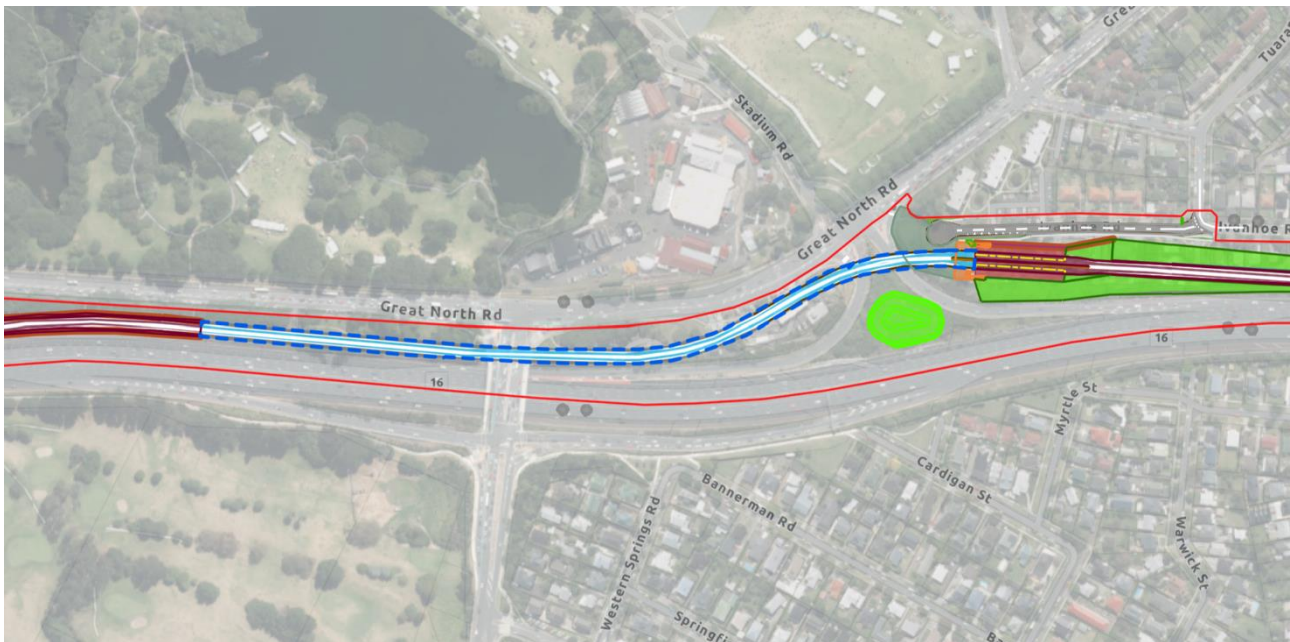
Plan of the proposed new viaduct bridge (blue) aligned with SH16 and Great North Road, and the Western Springs station (right of image)
